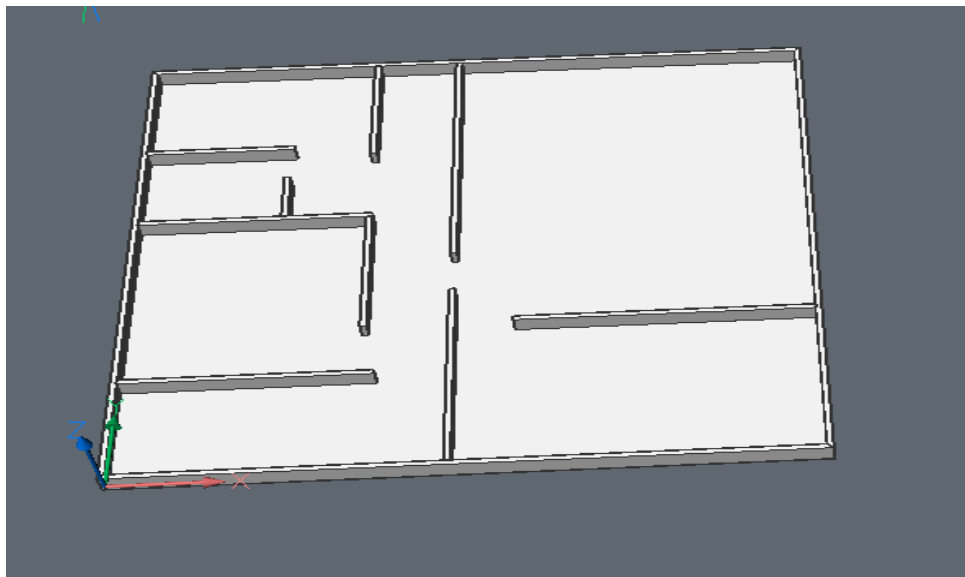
3D Floor Layout Created in BricsCAD BIM
